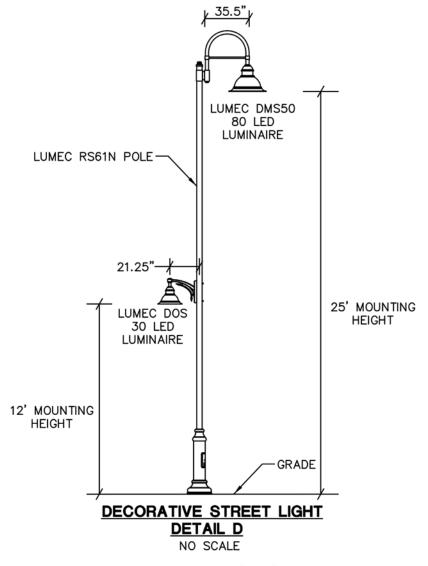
Example of Fairfield Station Area Plan Lighting Styles
